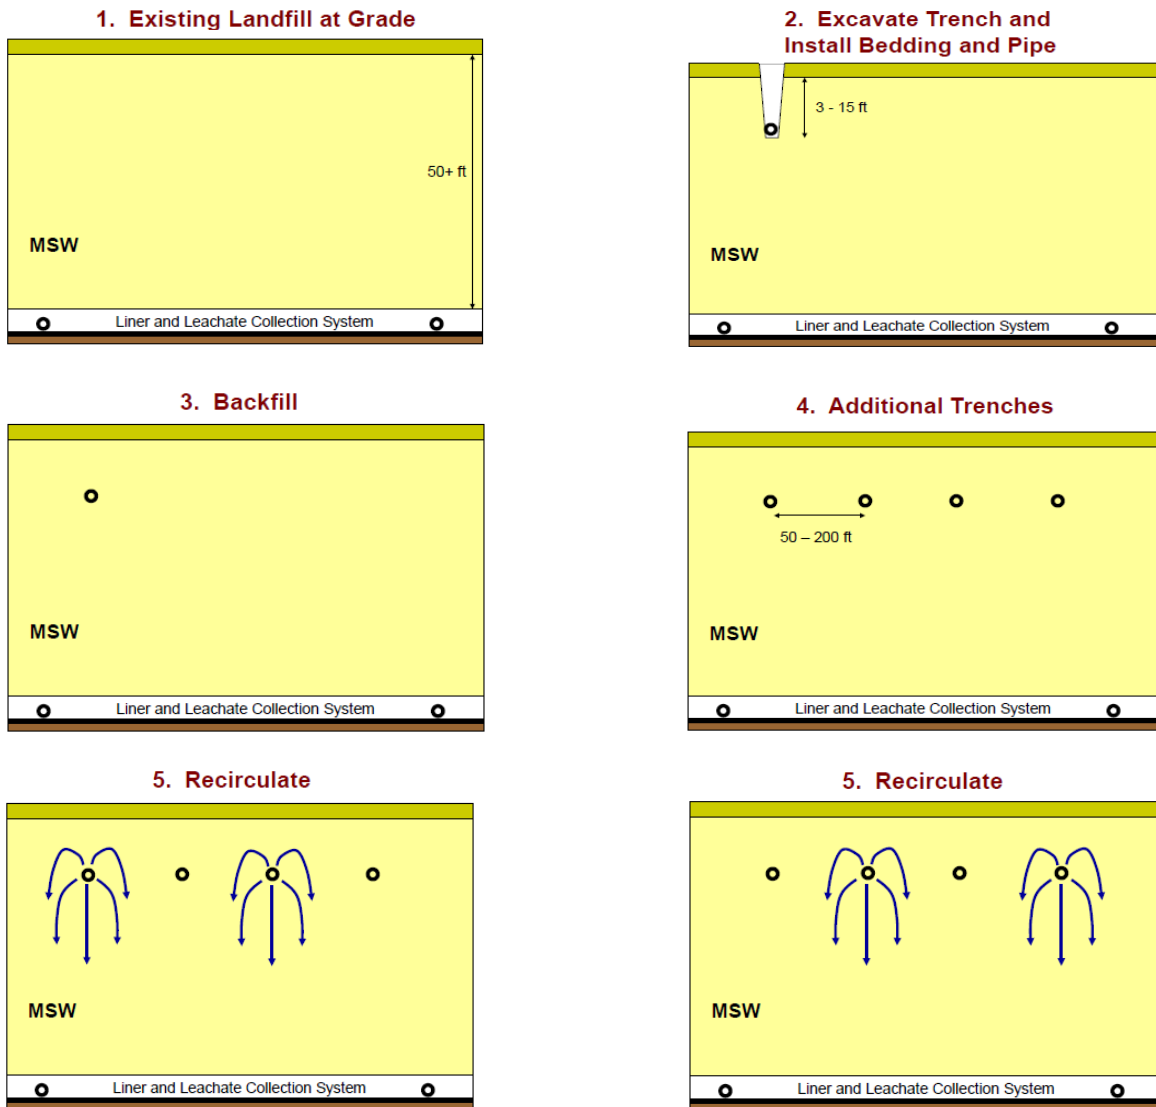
Installation and application of leachate using Shallow Horizontal Trenches (Townsend, 2008)
